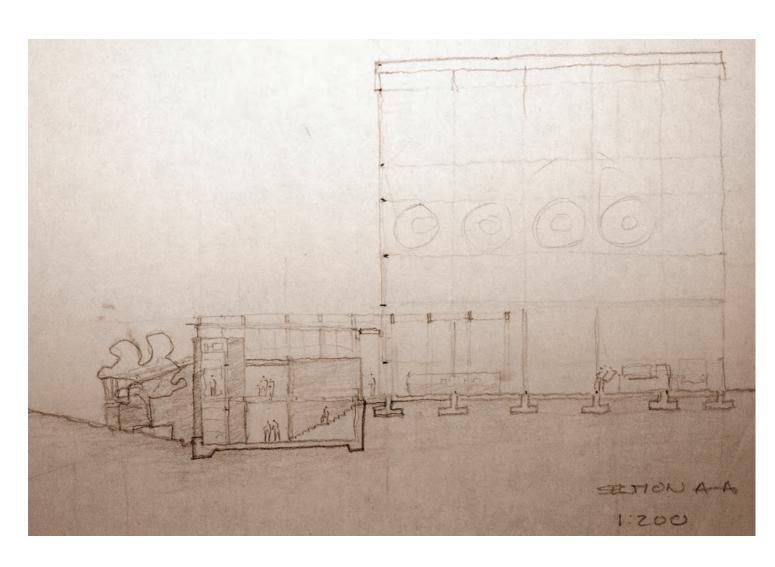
Section through entrance into new building at first design presentation (Author 2014).
